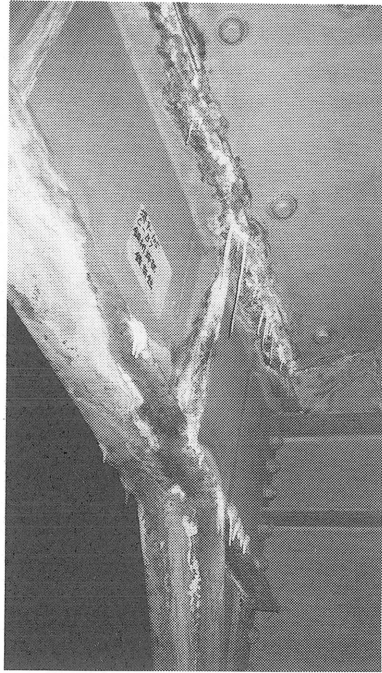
Example of Leakage and Corrosion of Steel Girder at the Bottom
